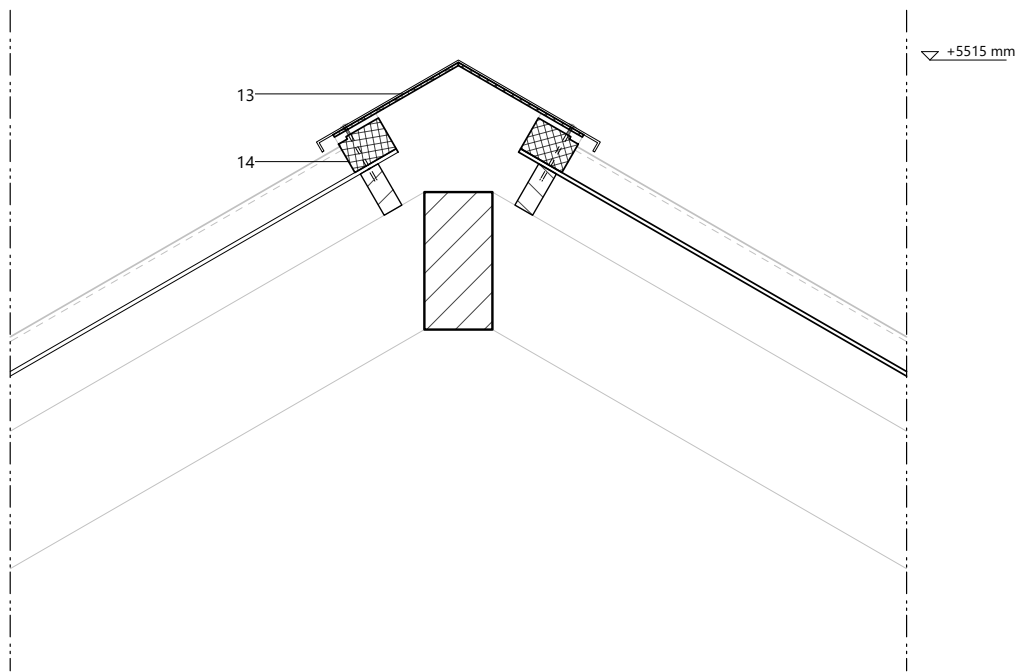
Horizontal detail 1:5 (scaled to 50%)
